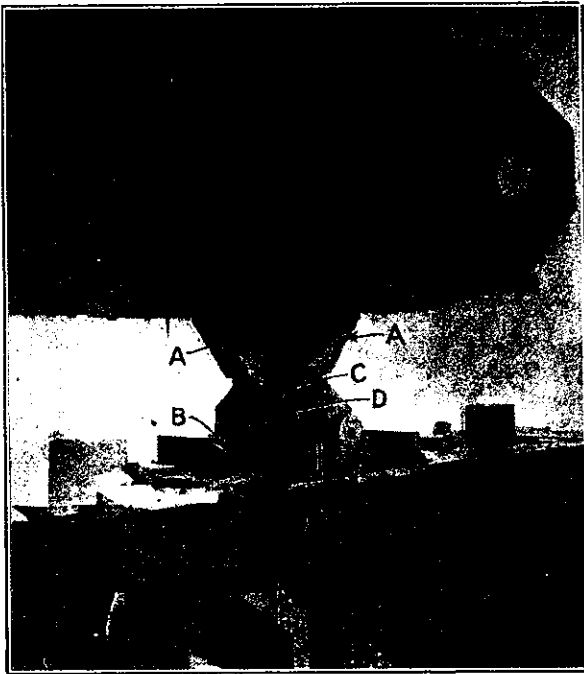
Rocker-joint bearing between lifting girder and suspended span.
